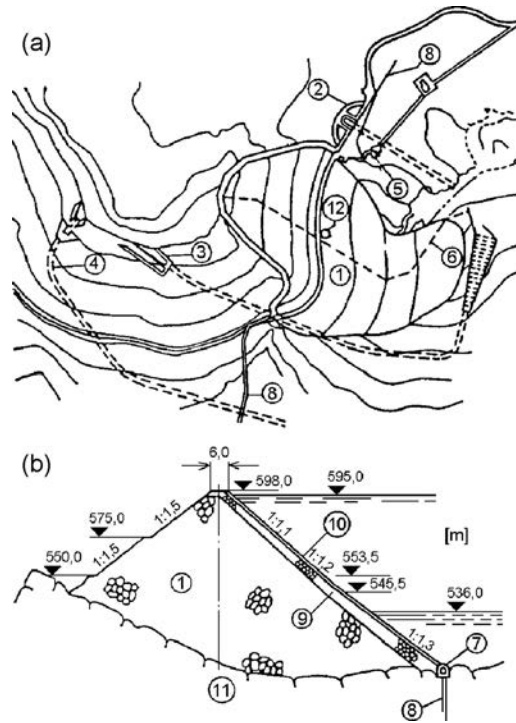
Layout plan (a) and cross-section (b) of Rama dam. (1) Dam's body; (2) spillway; (3) diversion tunnel; (4) derivation (supply) tunnel; (5) observation station; (6) drainage gallery; (7) grouting gallery; (8) Grout curtain; (9) sub-facing layer; (10) reinforced concrete facing ( $d = 30\text{--}90\text{ cm}$ ); (11) limestone in foundation; (12) measuring manhole.
